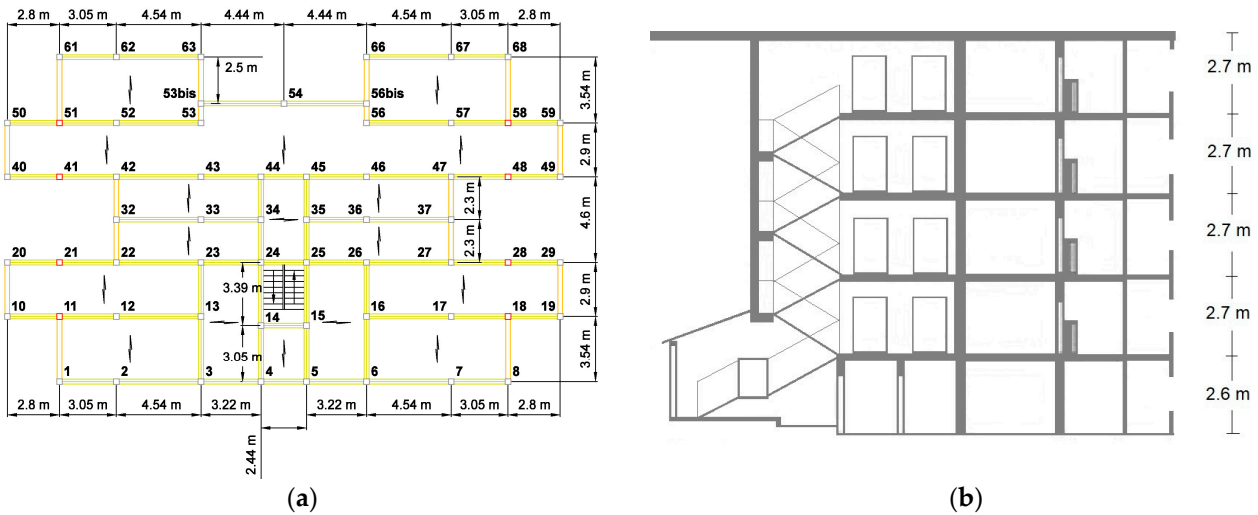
Surveyed building: (a) Floor plan with the frame distribution. Arrows indicate the orientation of unidirectional slabs; (b) Cross-section of a module.
